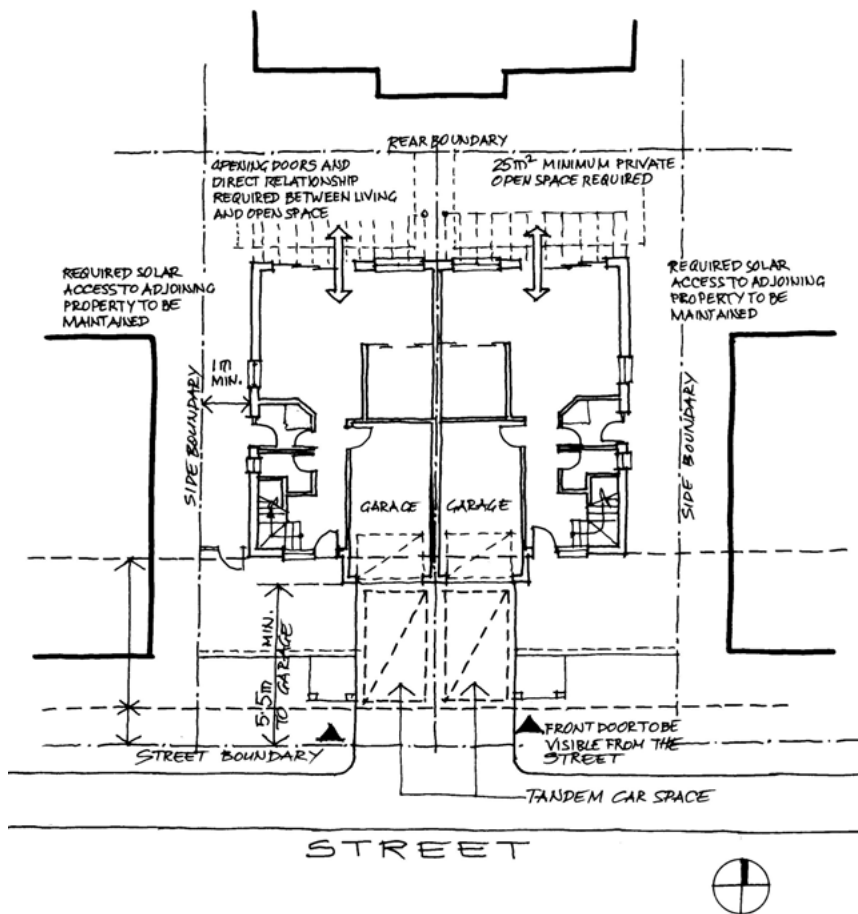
Town house layout (south to the street).
